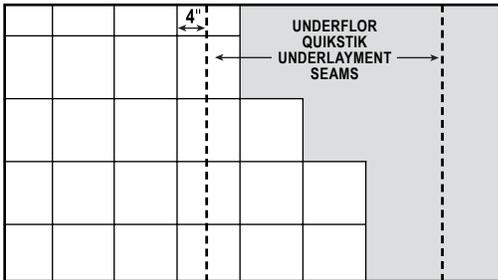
Position UnderFlor QuikStik Underlayment seams at least 4" away from tile joints.
